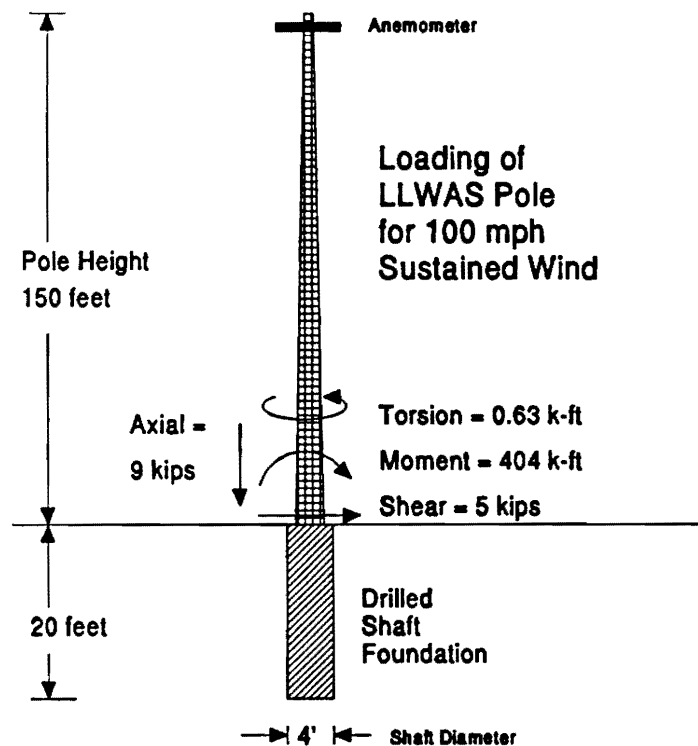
Structural Loads on the LLWAS Tower Foundations
